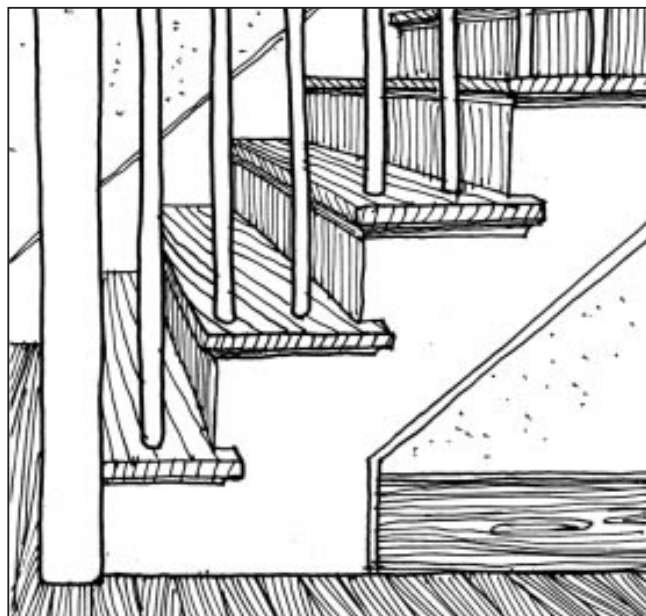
Mixing painted and natural-finish trim can be tricky around stairs. Note how the painted skirtboard seems out of place with the natural-finish risers and baseboard.
